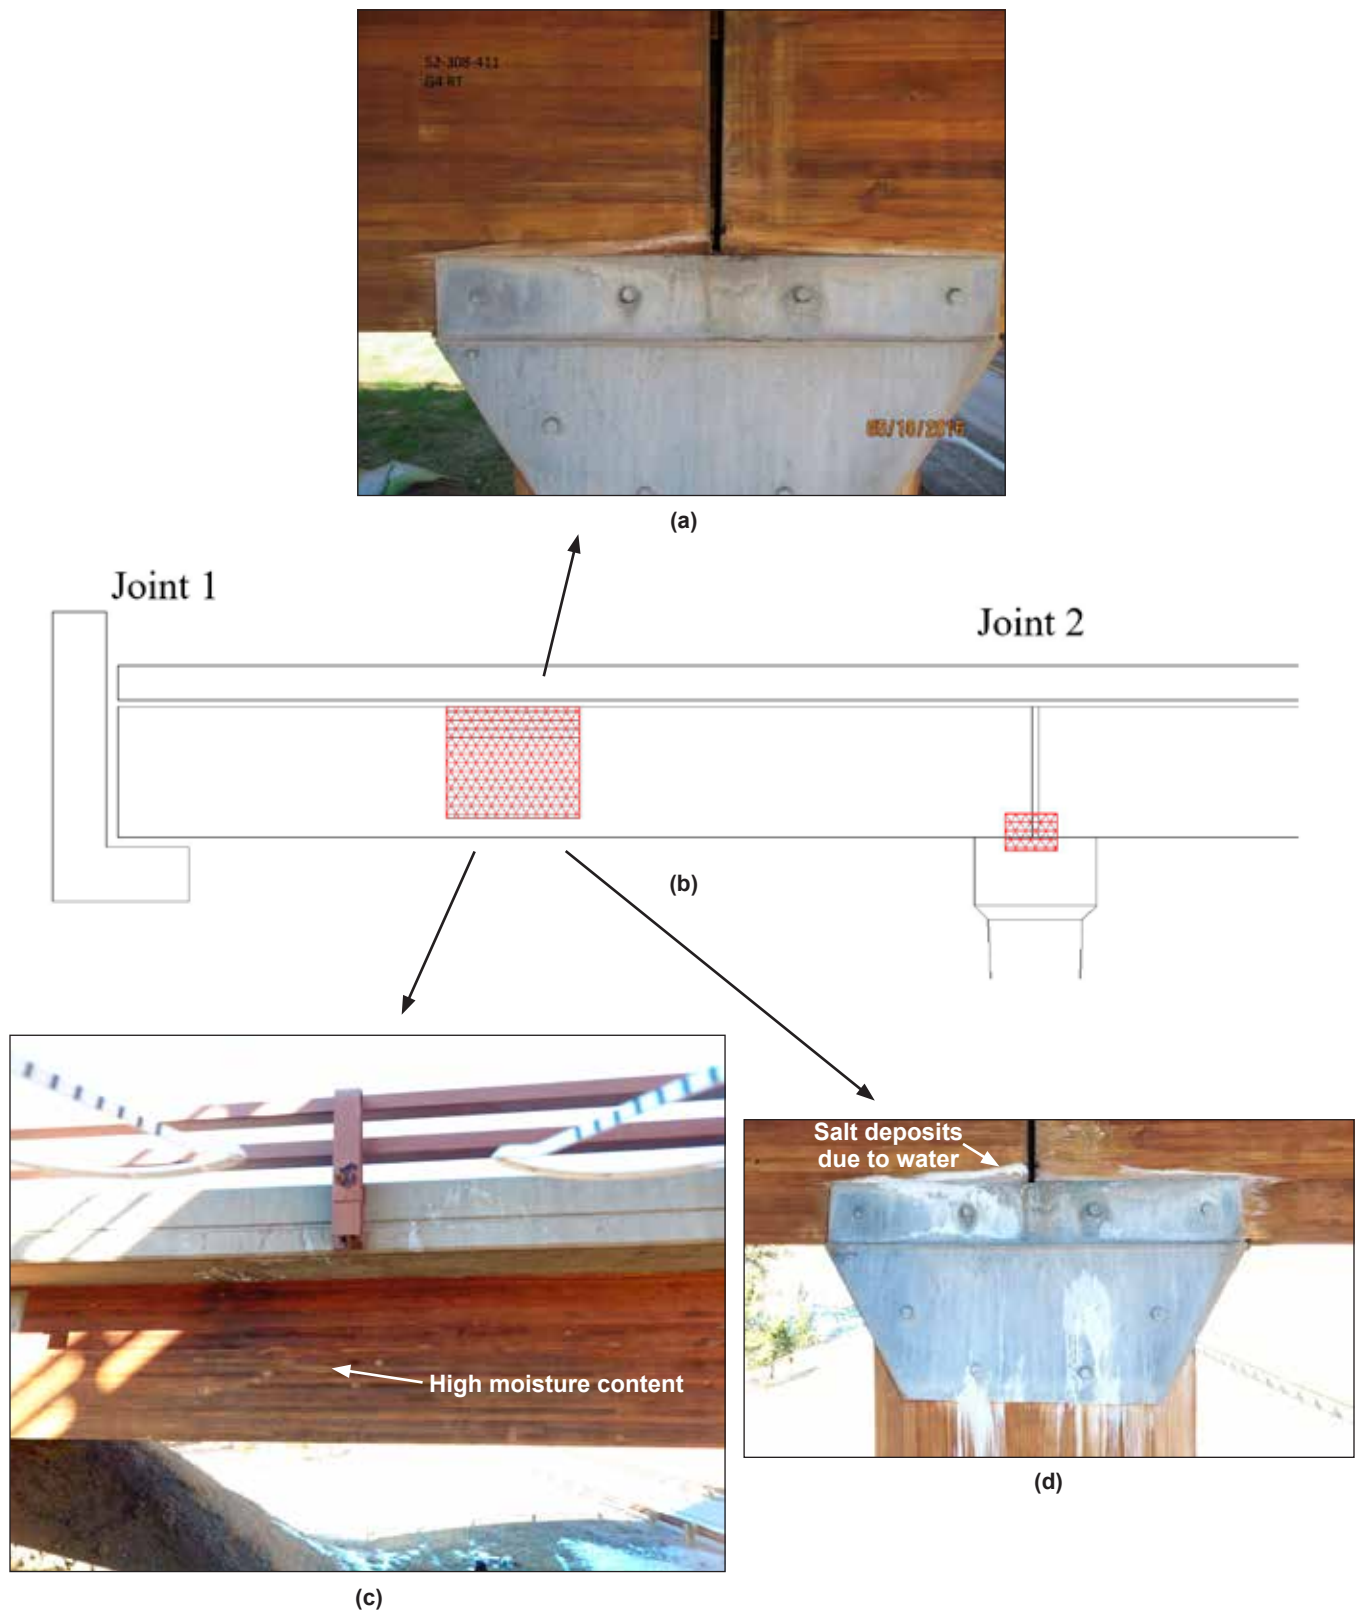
Sample damage on girder: (a) reference image taken during conventional inspection (used with permission from South Dakota Department of Transportation); (b) damage location; (c) some moisture on the side of Girder 4 between Joints 1 and 2; (d) salt deposits caused by water coming from deck at support of Girder 4 at Joint 2.
